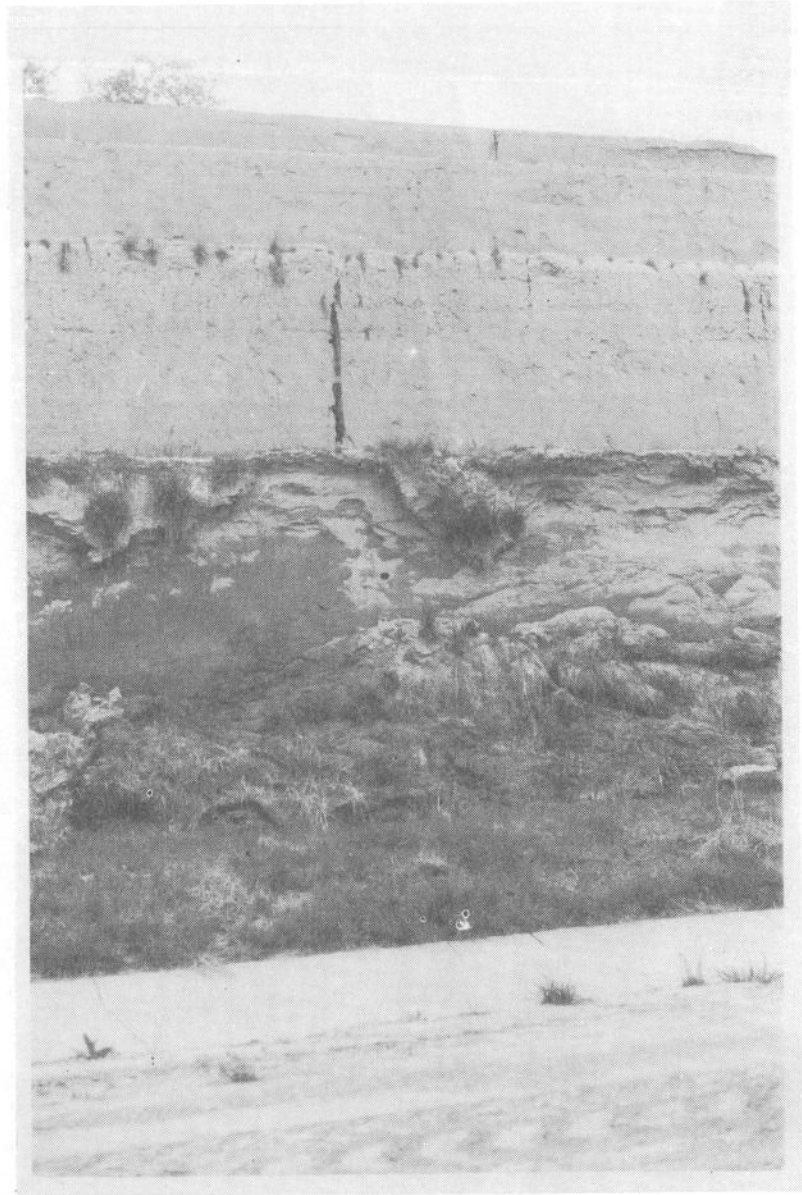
Slope damage due to persistent seepage from a truncated water table. Piping outlets in the face above are also evident (Holt County, Route I-29)
